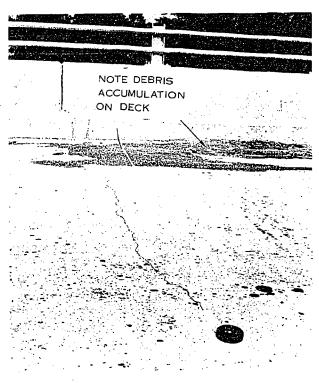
Transverse deck crack. Crack originated at expansion joint in parc pet. Note debris in gutter area.
